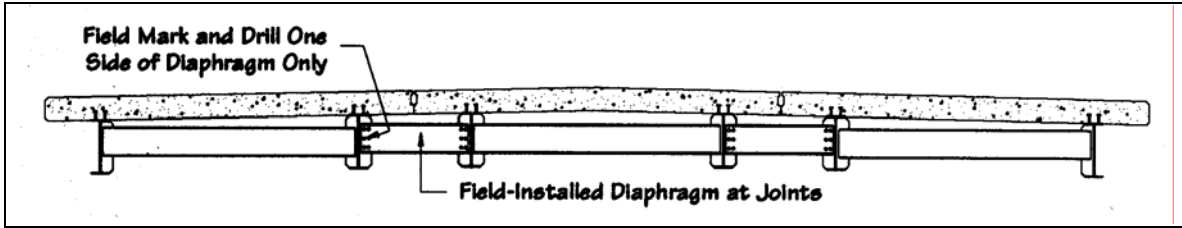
Bridge cross section with three Inverset Bridge System units (The Fort Miller Co., Inc., 1998)
